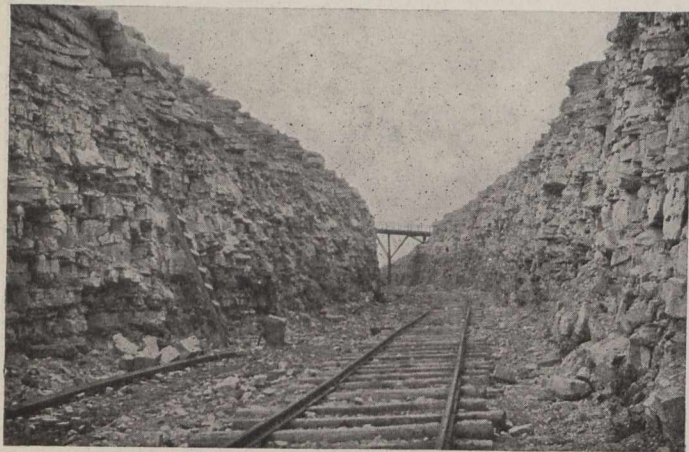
Rock-cut on G.T.R. Relocation, 3rd Curve. Thorold (Section 3).
